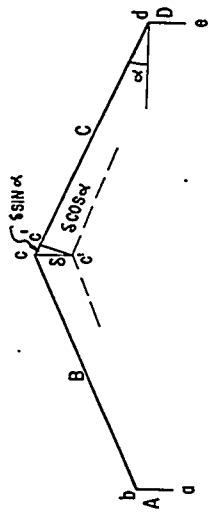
SECTION THROUGH A TYPICAL RIDGE
